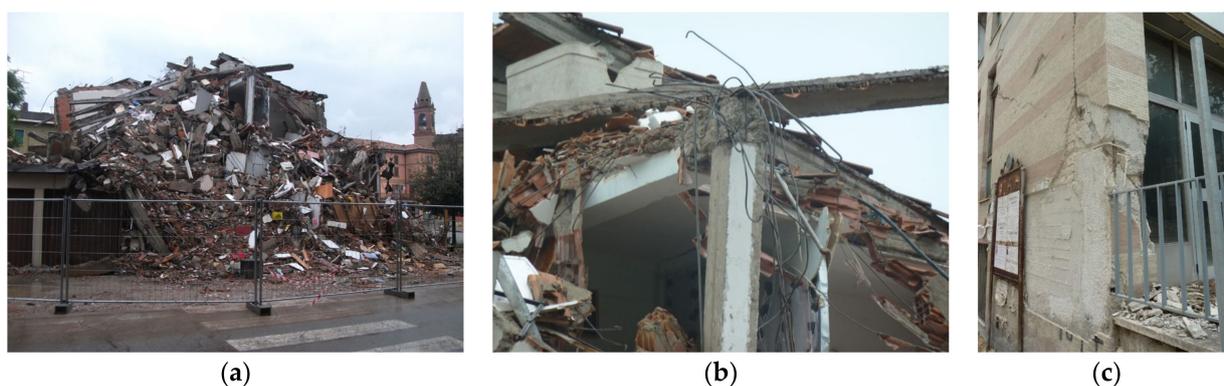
Emilia, Italy—2012: (a) RC structure collapsed in Cavezzo; (b) inadequate reinforcement joint detail; (c) damage of columns due to inadequate detailing for confinement.
